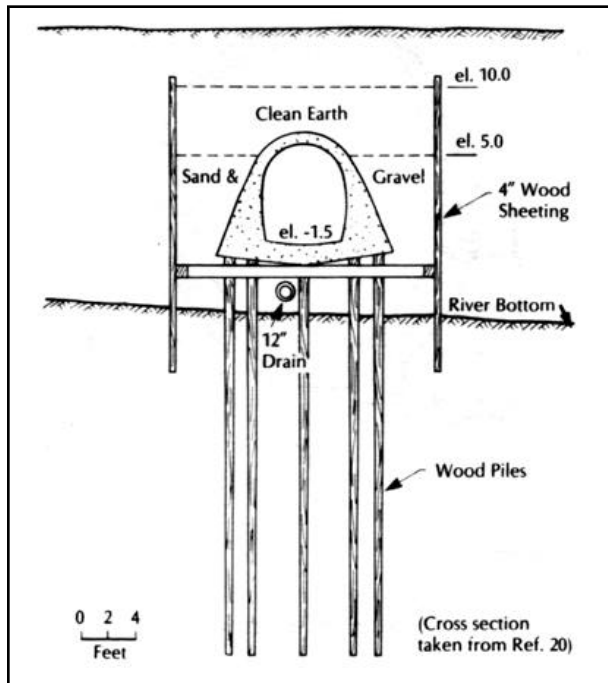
A typical cross section of the Boston Marginal Conduit.
